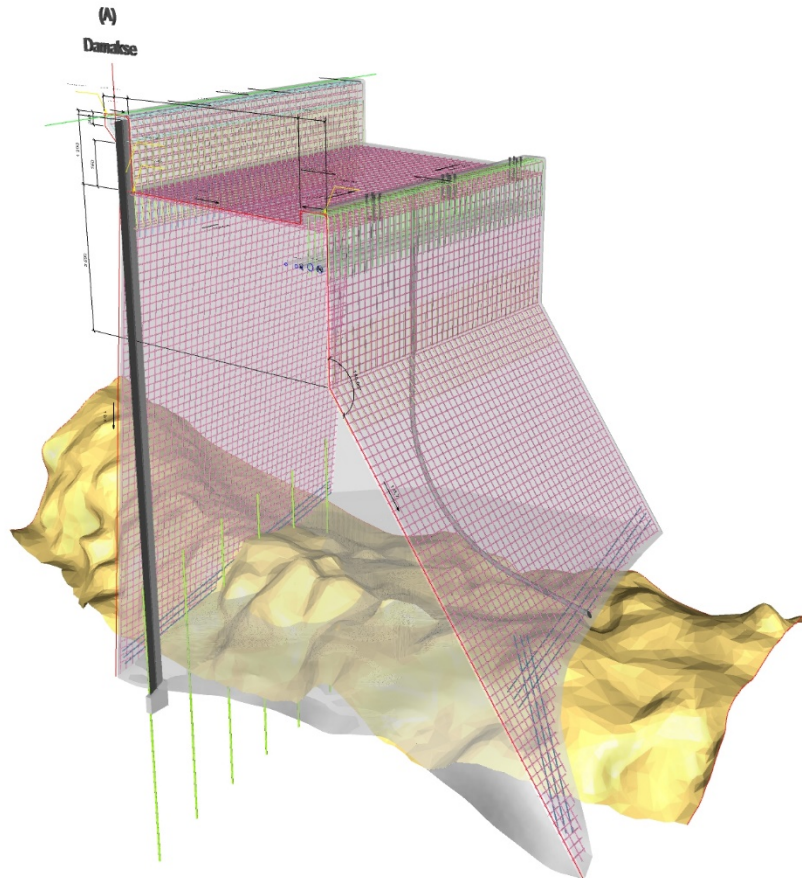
Typical dam section of the new Mjåvatn dam in Norway with concrete, reinforcement, grouted rock bolts and embedded parts.
